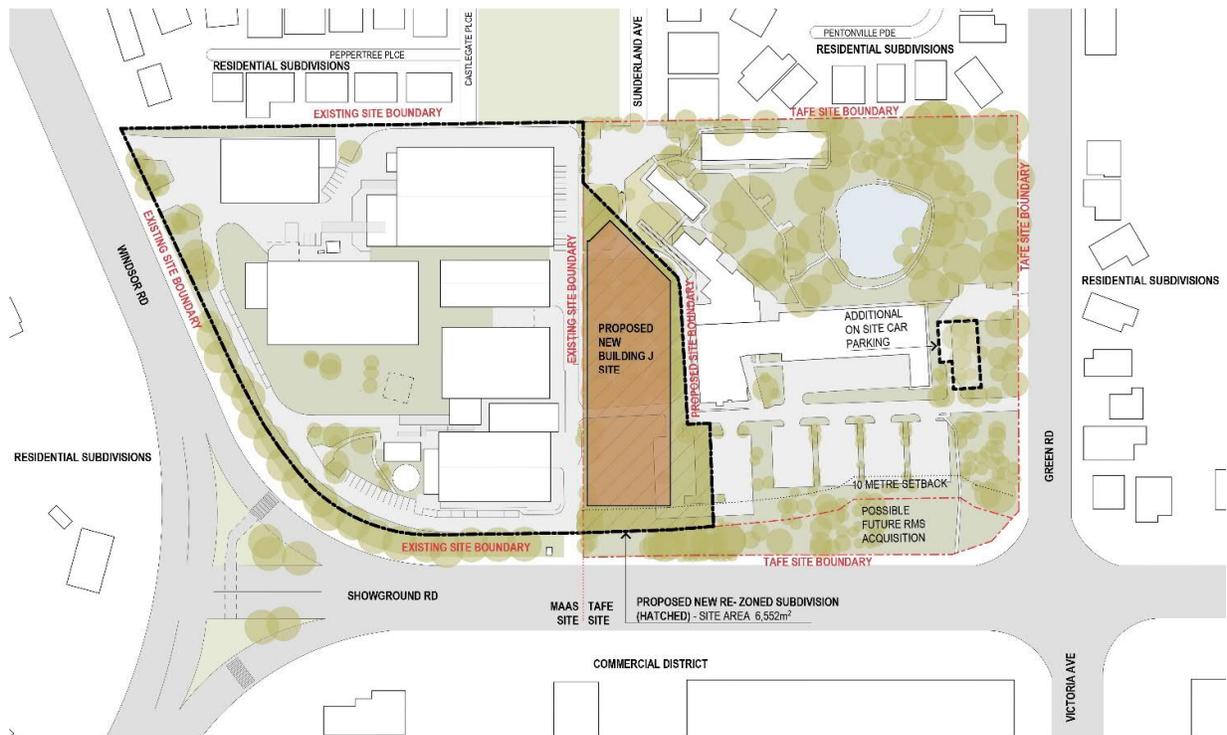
Existing site layout plan and proposed development site (Source: Lahznimmo Architects)
